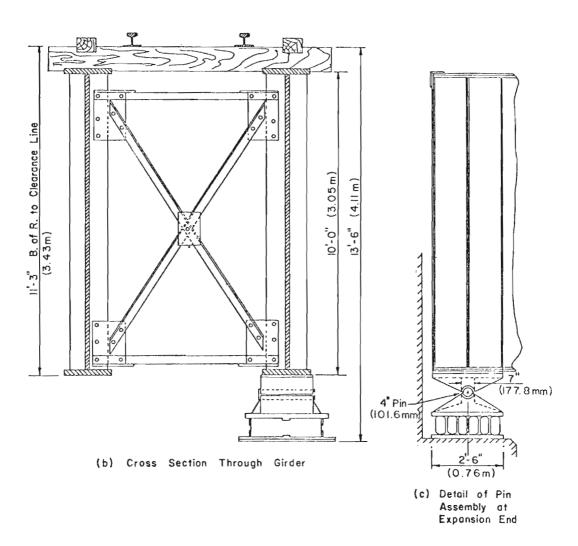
DETAIL OF BRIDGE STRUCTURE. The single-track, two-girder structure was restrained against lateral movement only by frictional forces on the pins.
